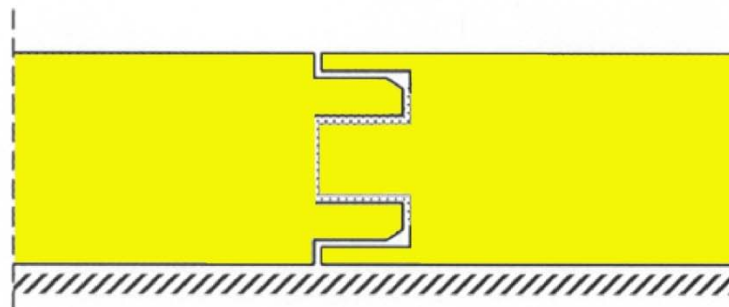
Joint type V (similar to type I but with a cut-to-shape joint without sealant)
